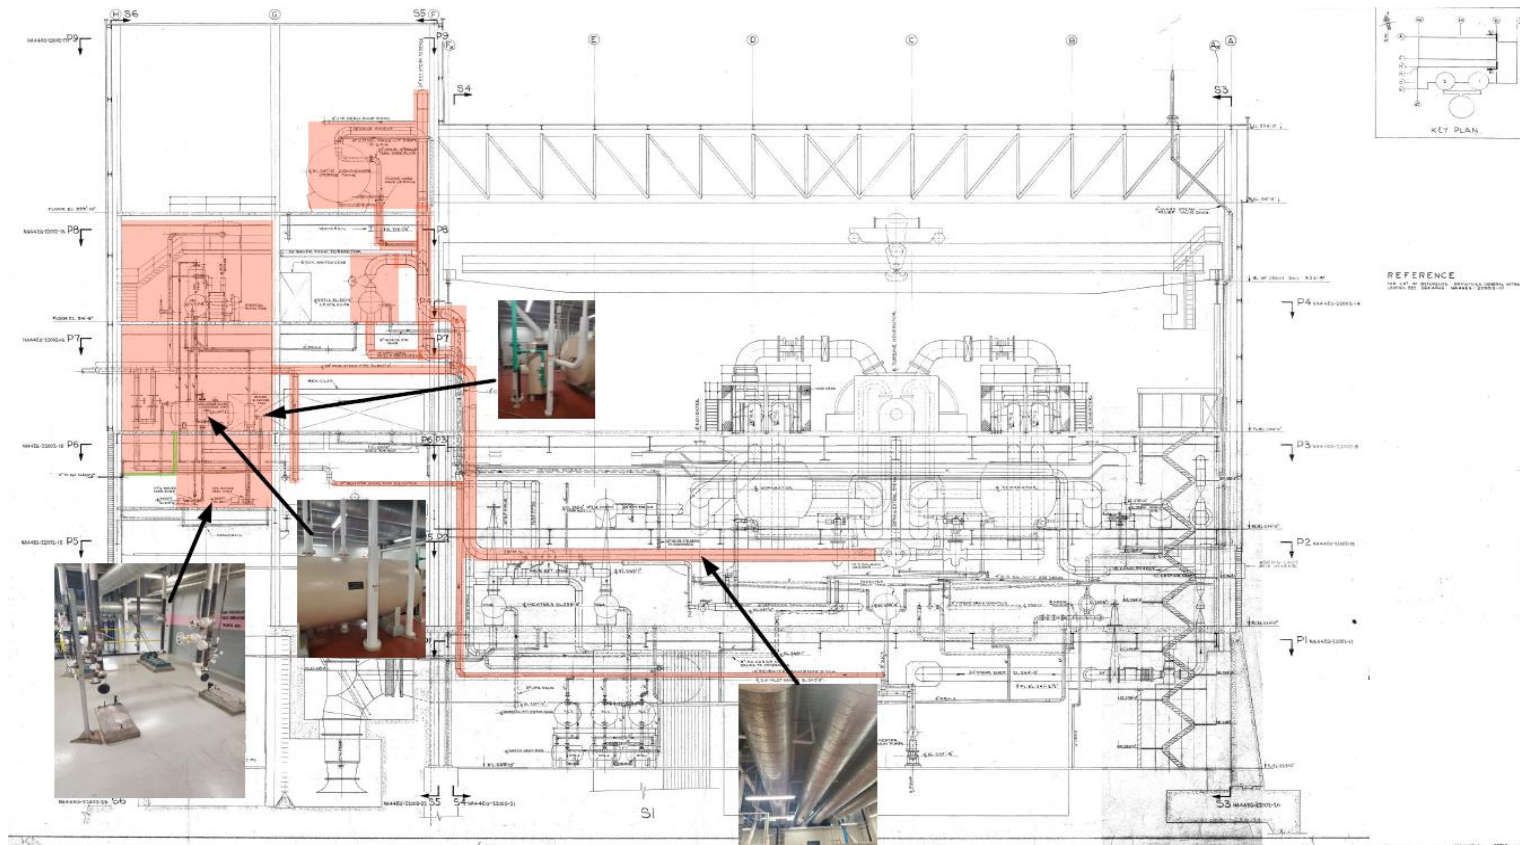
TAB Unit 1 Plant Arrangement - Elevations 254 to 339
